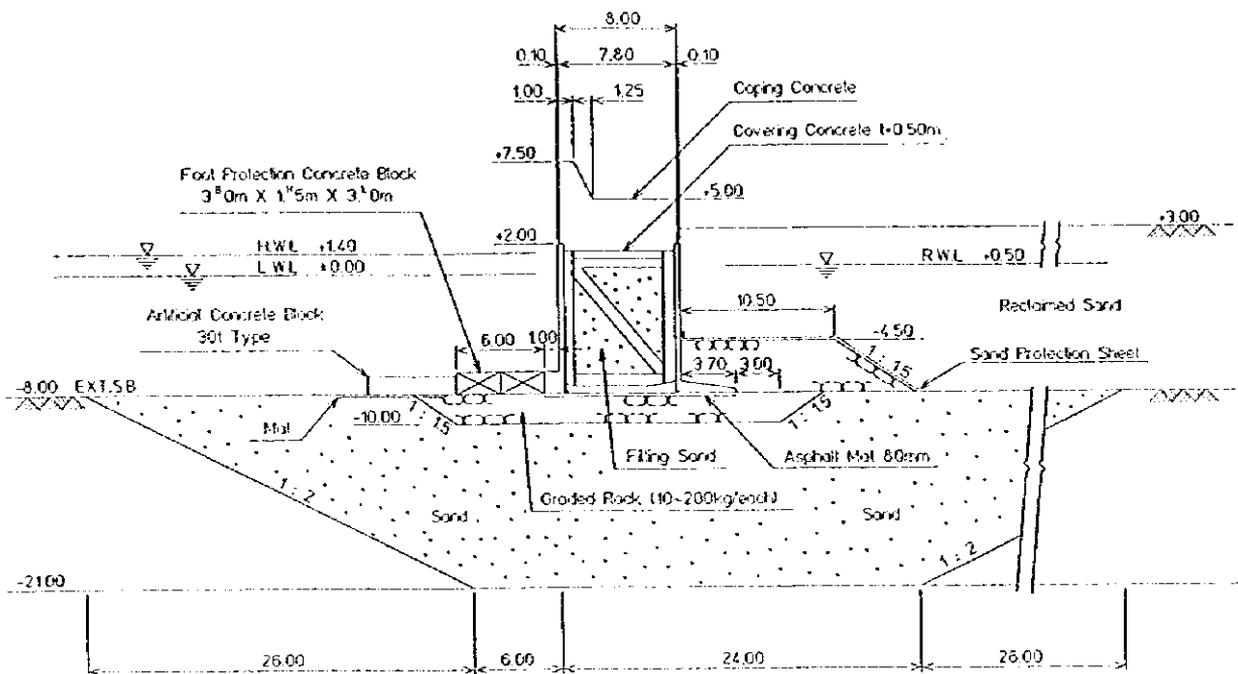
(2) Typical Cross Section of Seawall (Hybrid Caisson)
